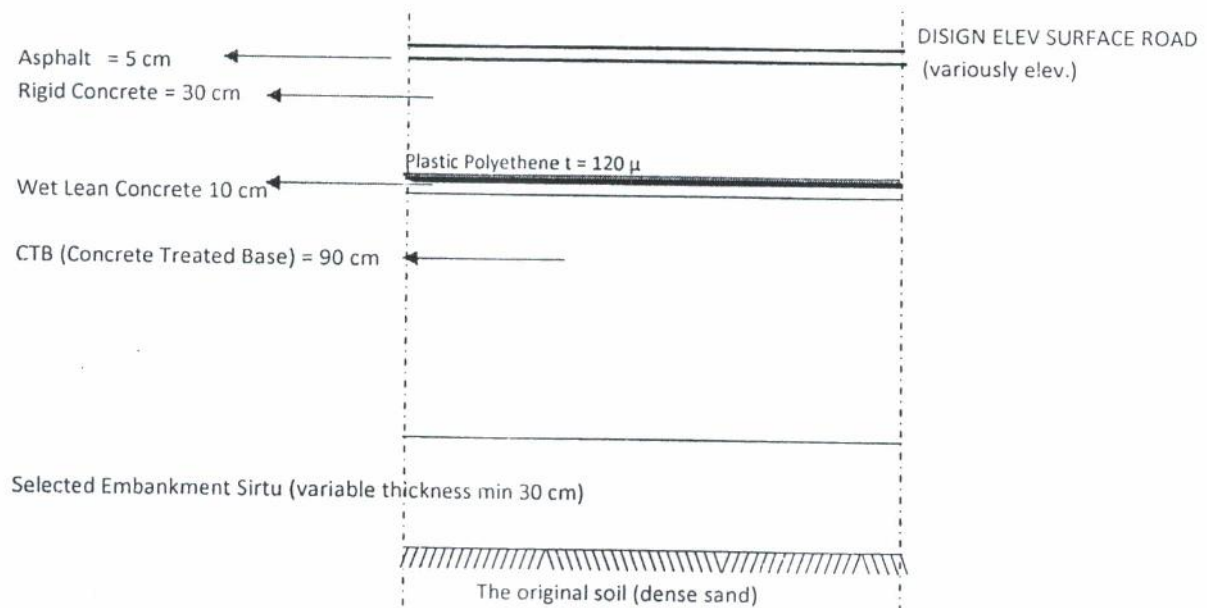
The General Proposed road construction in STA 7+820 JICT
